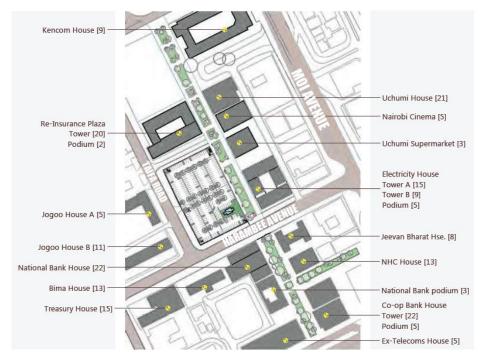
Plan drawing of Aga Khan Walk from City Hall Way to Haile Selassie Avenue.
